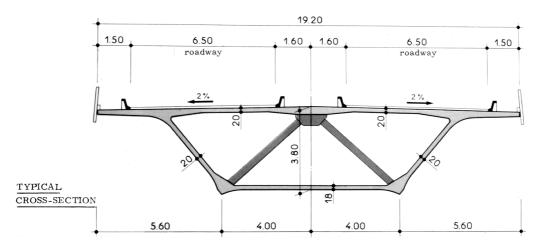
Brotonne Bridge — typical cross section. (Courtesy of Campenon Bernard.)
